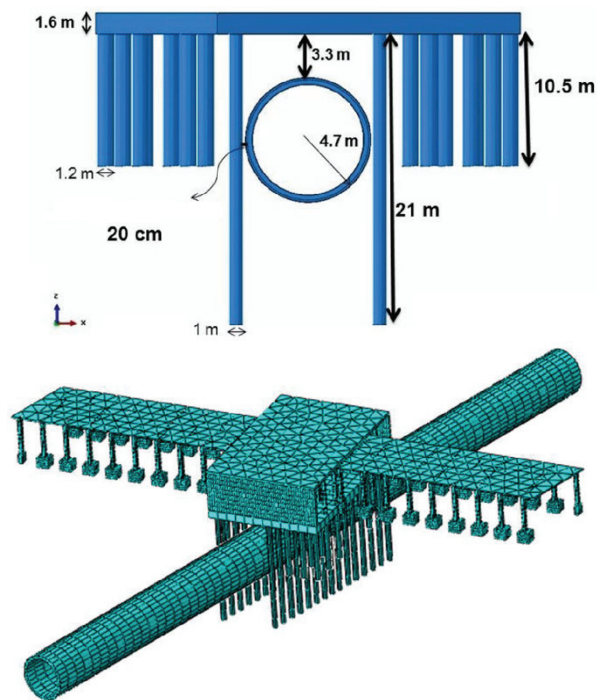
Modeling the station and position of the lower tunnel relative to the station (Distance between pile and tunnel wall = 20 cm)
